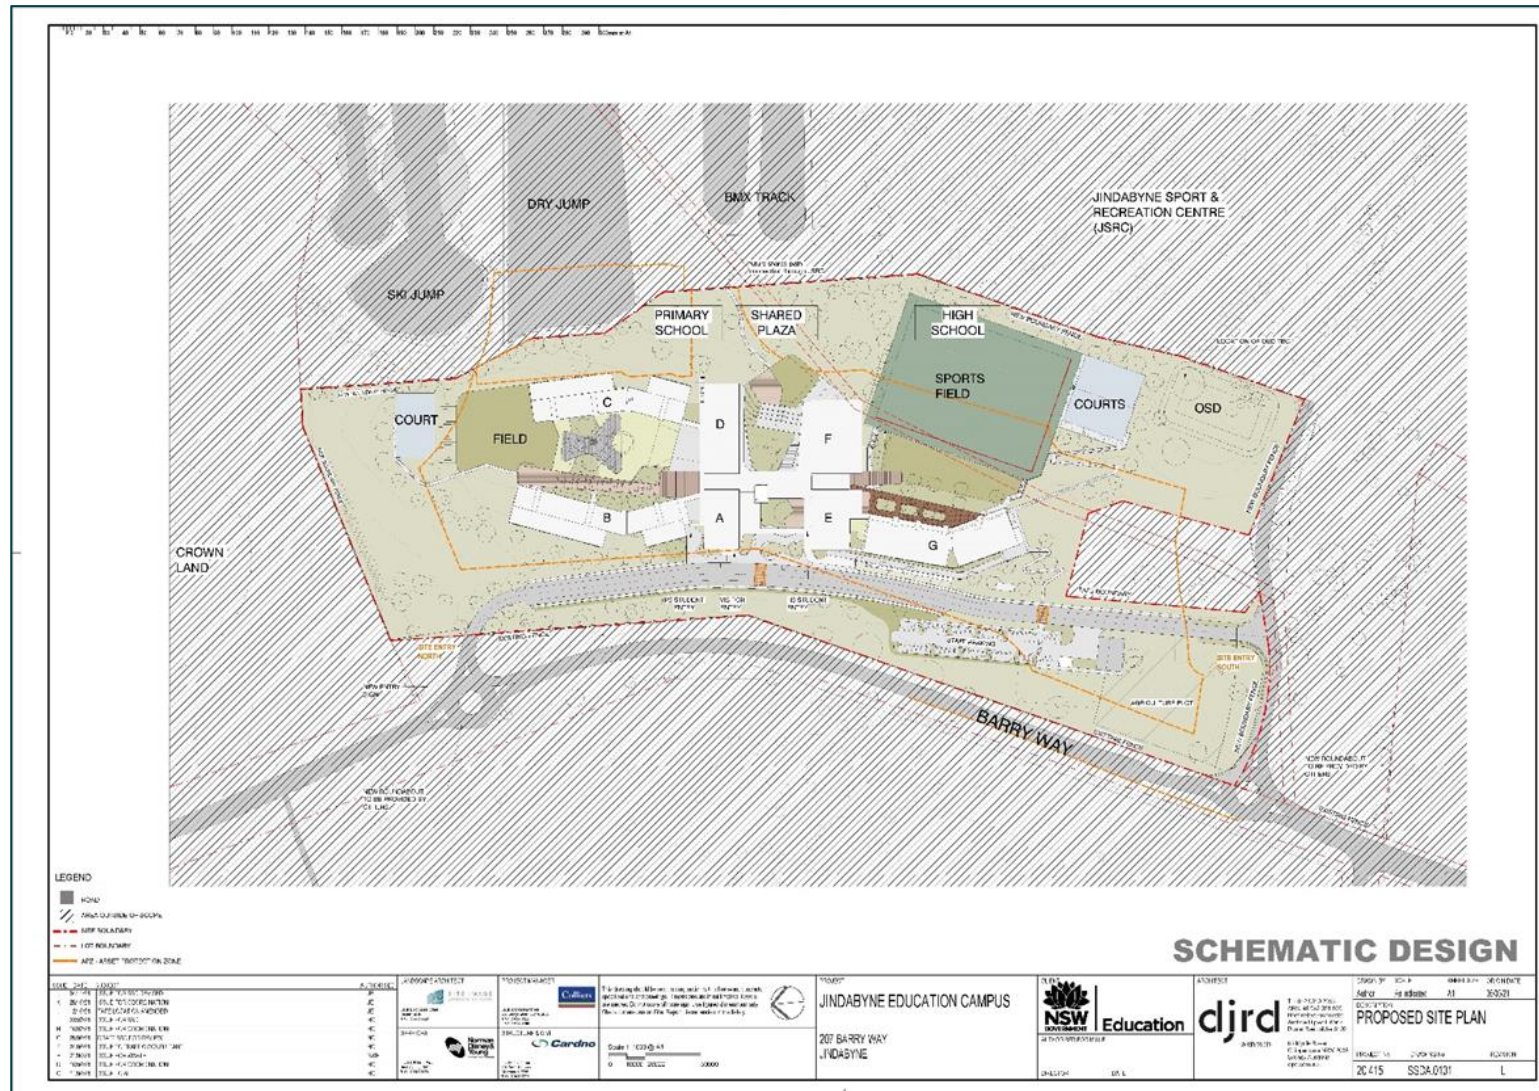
Proposed layout of campus (Source: DJRD Architects).
